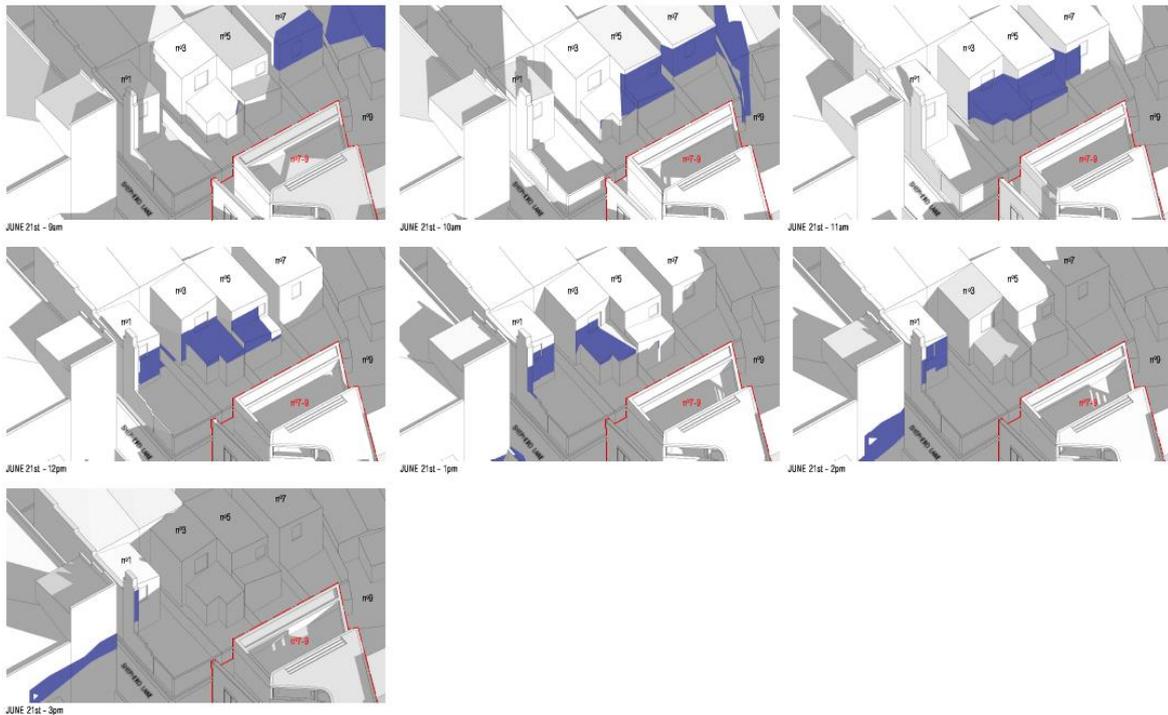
Shadow diagrams submitted with the application showing the extent of additional overshadowing on the terrace row to the south
